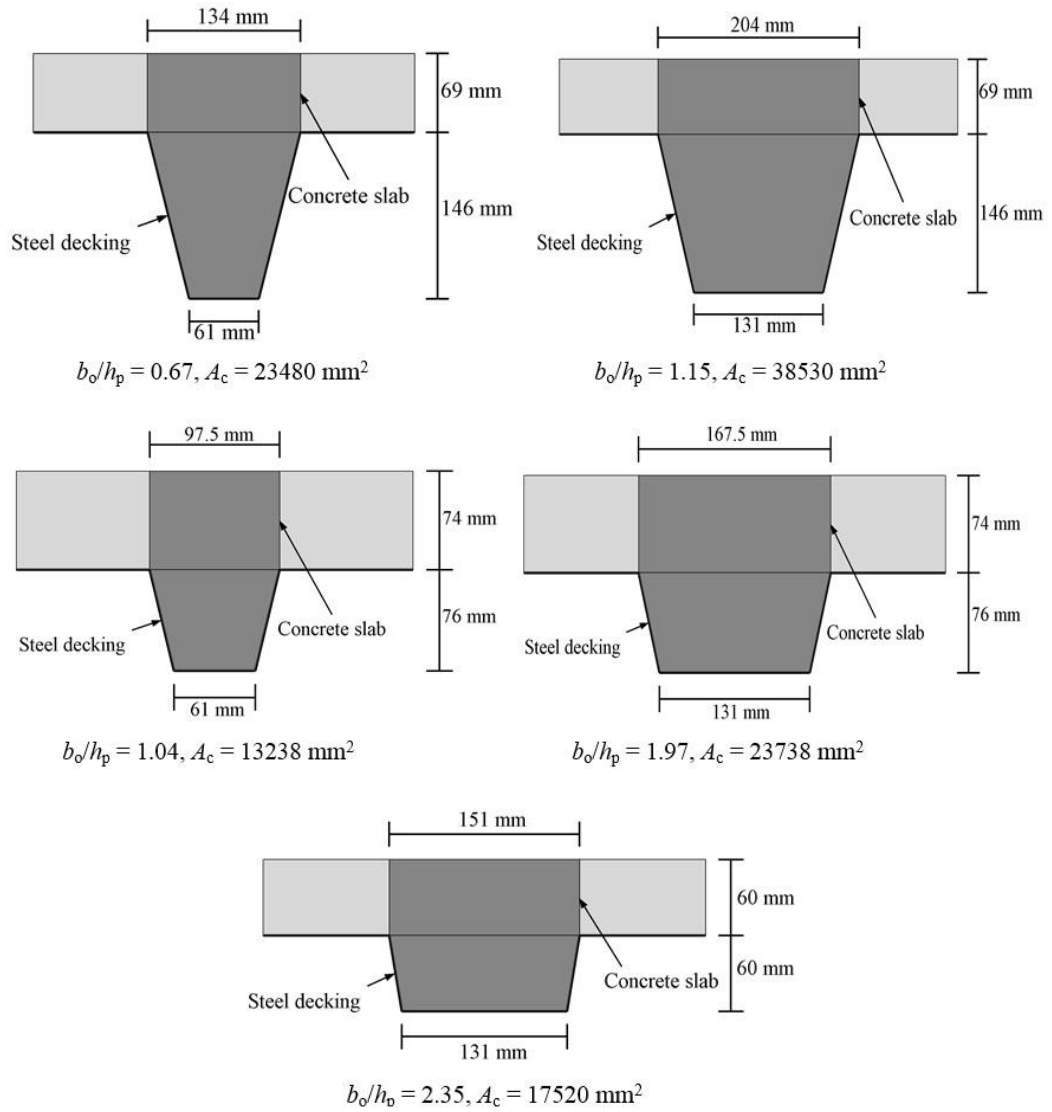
Details of steel decking with their effective cross-sectional area of concrete (A_c)
